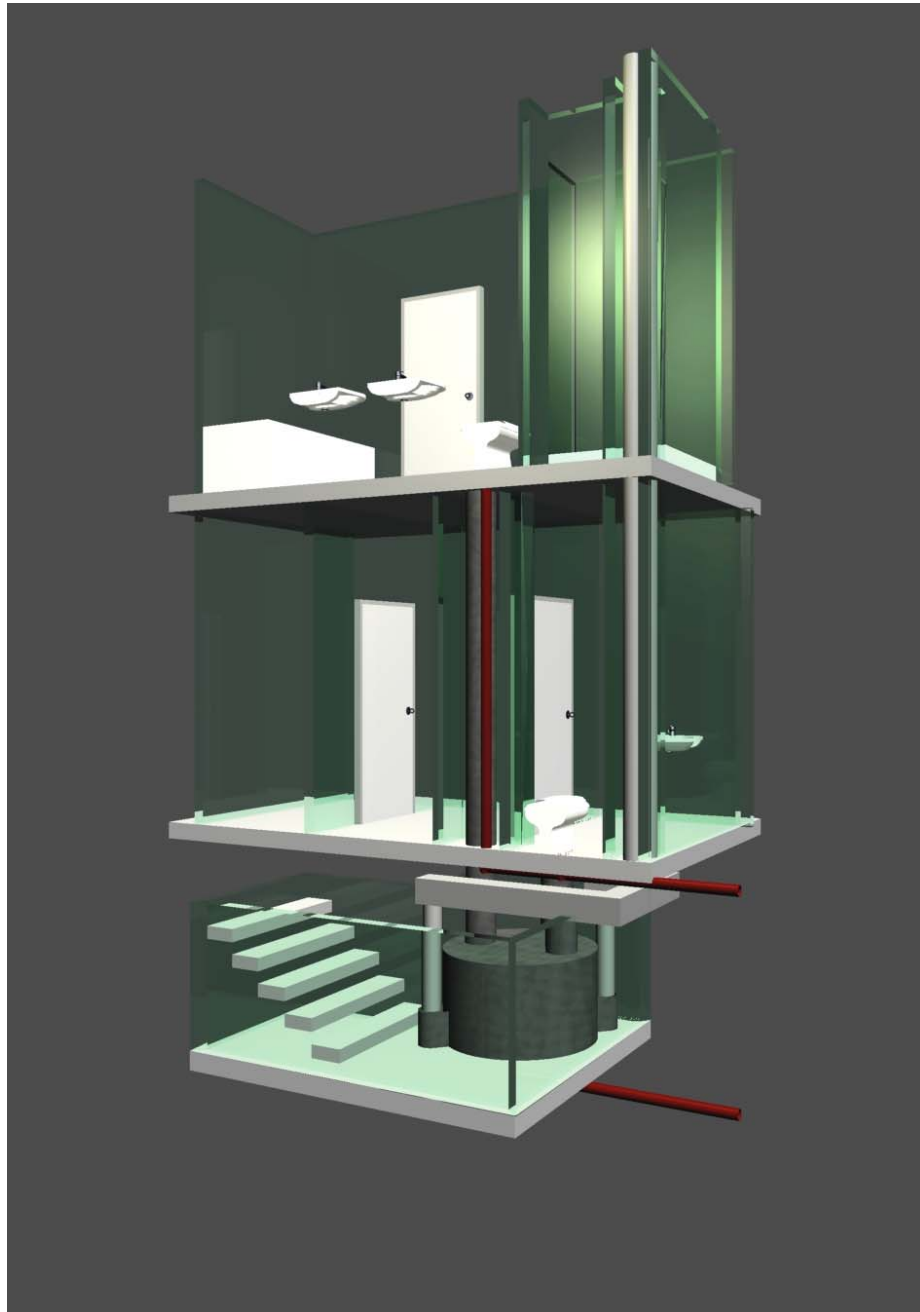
Cut-away Architectural Perspective of Composting Toilet System Installed in a 2-Storey Apartment
